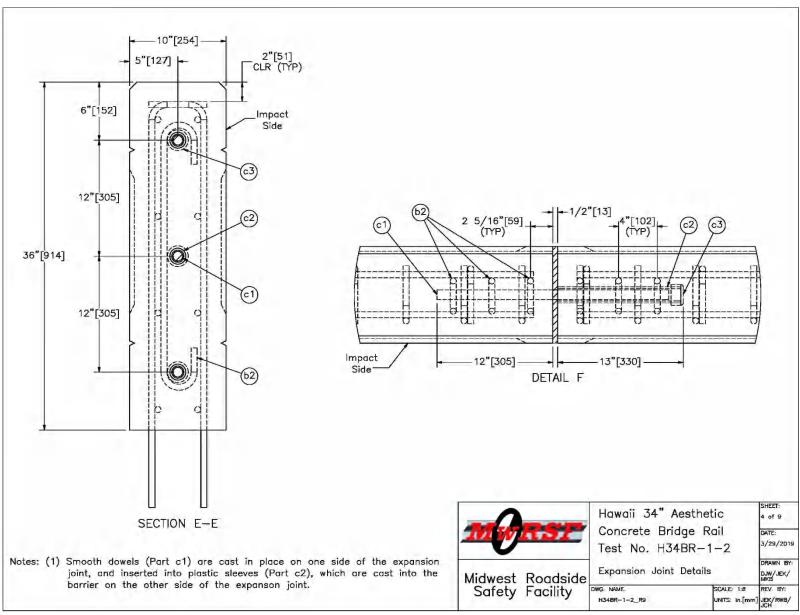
Expansion Joint Details, Test Nos. H34BR-1 and H34BR-2
